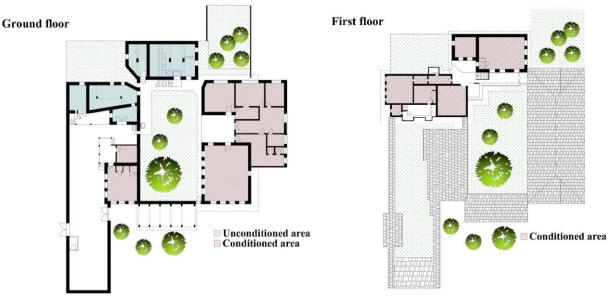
Svrzo's house complex – ground-floor zoning (left), first-floor zoning (right) (Source: authors)
